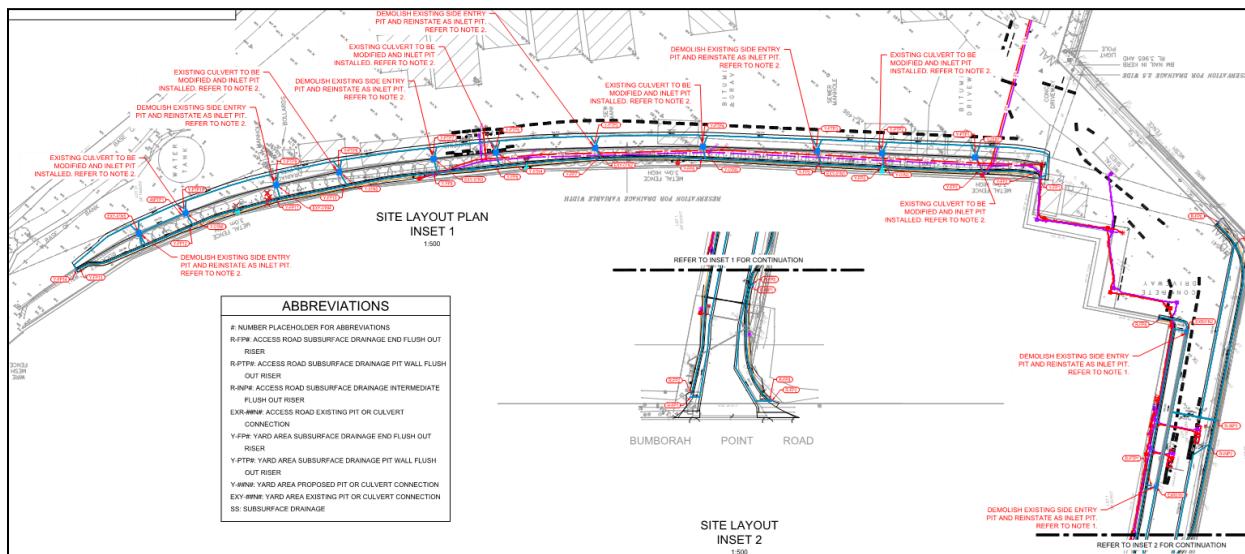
Reconstruction of five (5) Drainage Pits (Source: Mott Macdonald, 2023)
